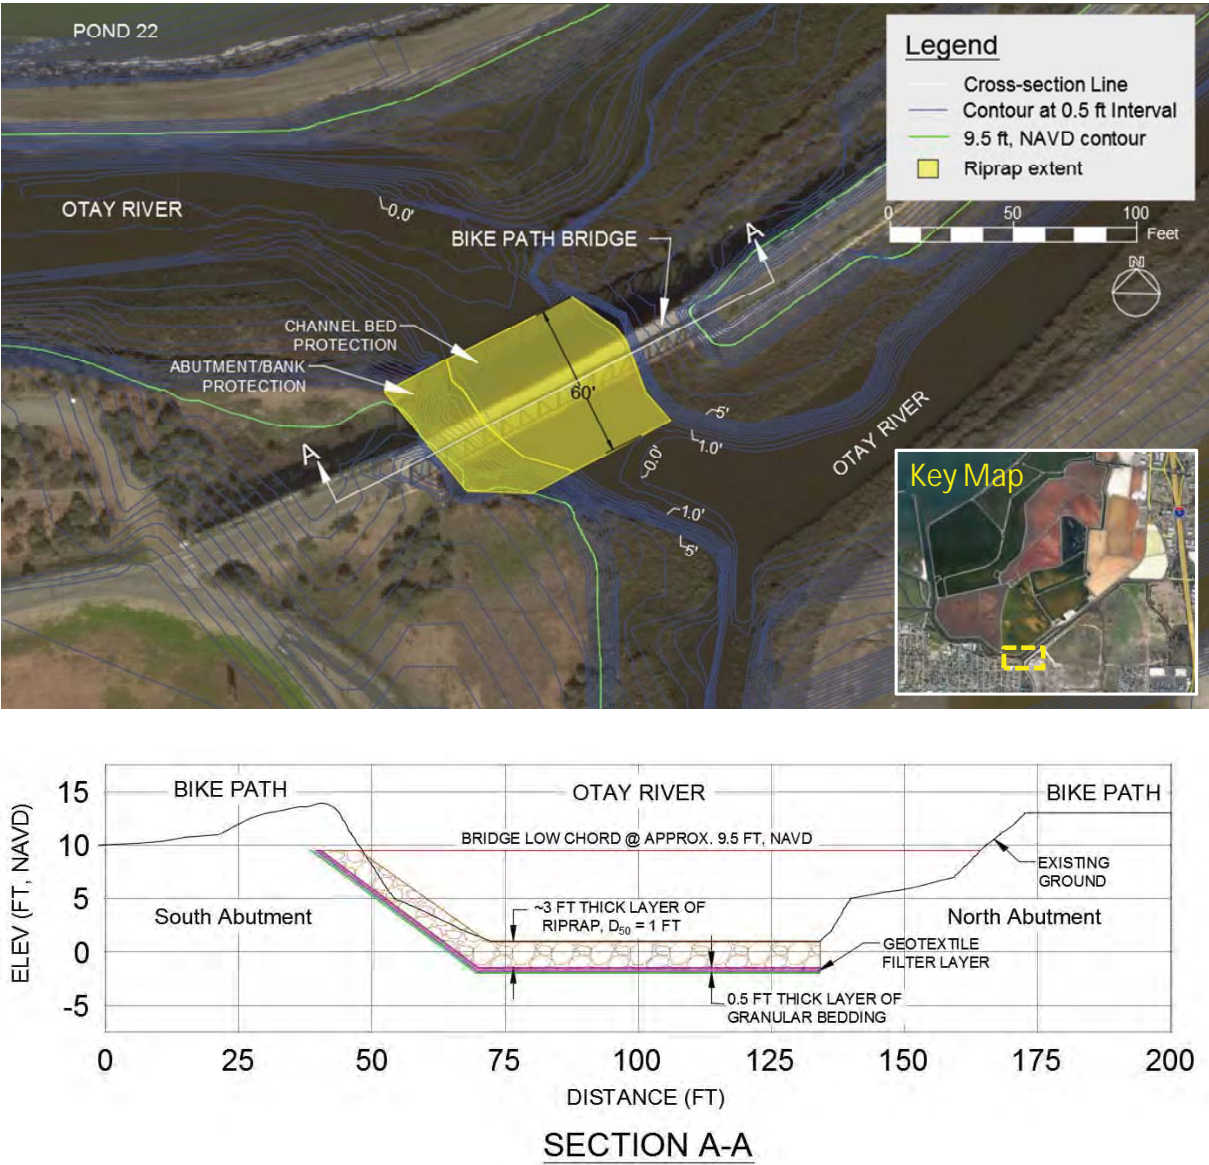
Conceptual Design for Revetment Protection at the South Bayshore Bikeway Bridge (Do Not Use for Construction)
